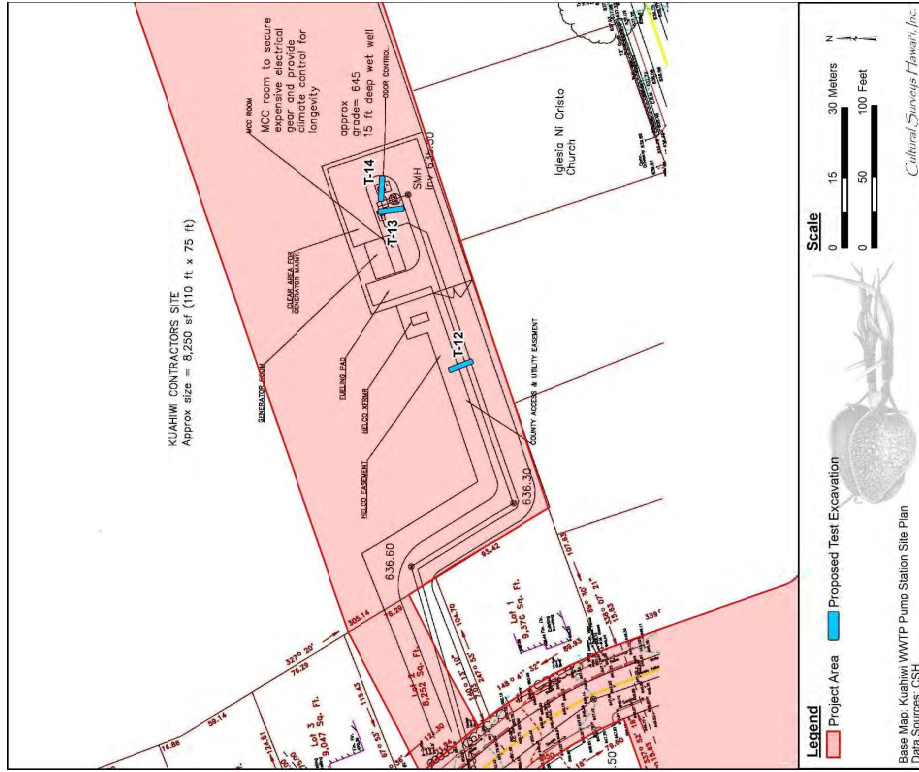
Client provided map showing approximate proposed locations for three test excavation trenches at the proposed at the proposed sewer pump station site at TMK: (3) 9-5-008:048
